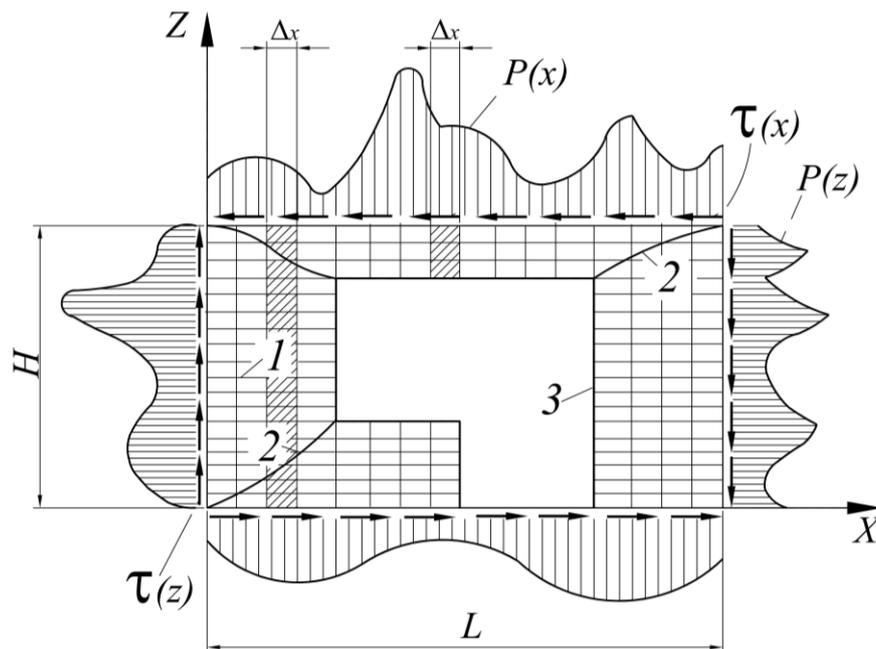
Calculation of plane stress reinforced concrete structures with openings for seismic action: 1 – limits of horizontal bands; 2 – cracks; 3 – opening.
